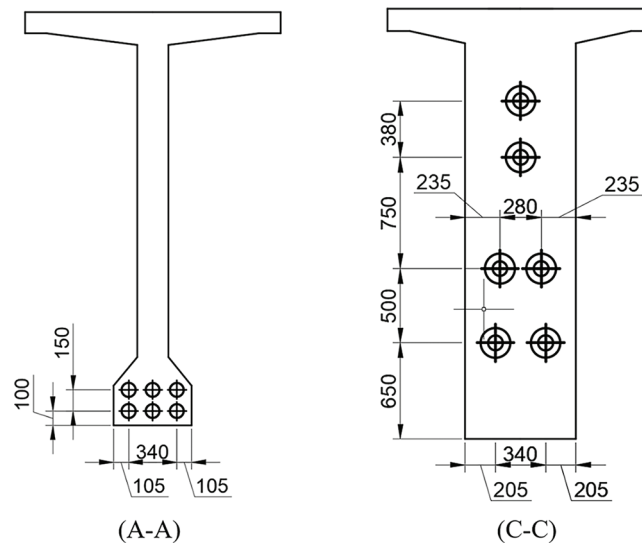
Layout of pre-stressed bundles at different sections (mm)
